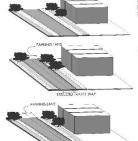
Waiver Diagram Reverse location of the planting strip and the sidewalk provides the perception of larger front yards and increased green space
